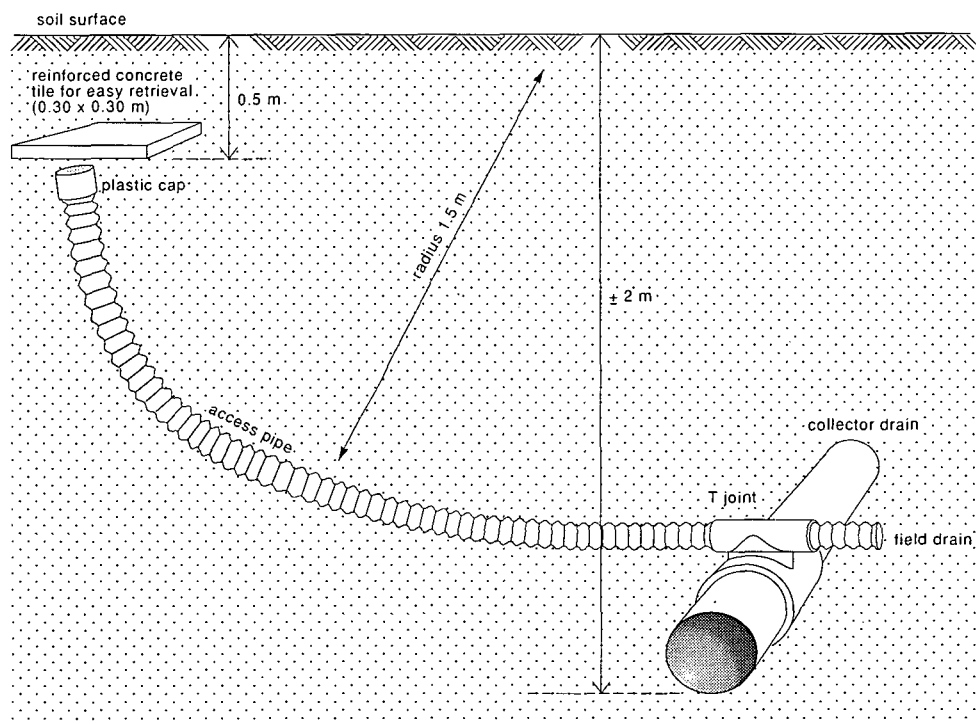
Connection of field drain to collector drain with access pipe to allow entry of jetting or rodding equipment
